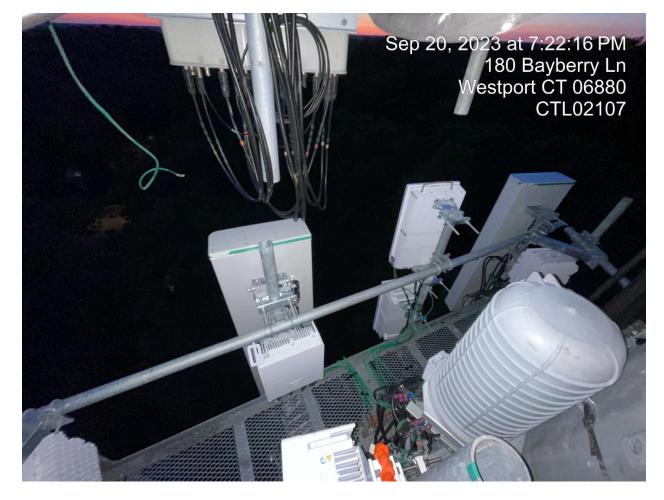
Installation of Antennas and Equipment on Gamma Sector
